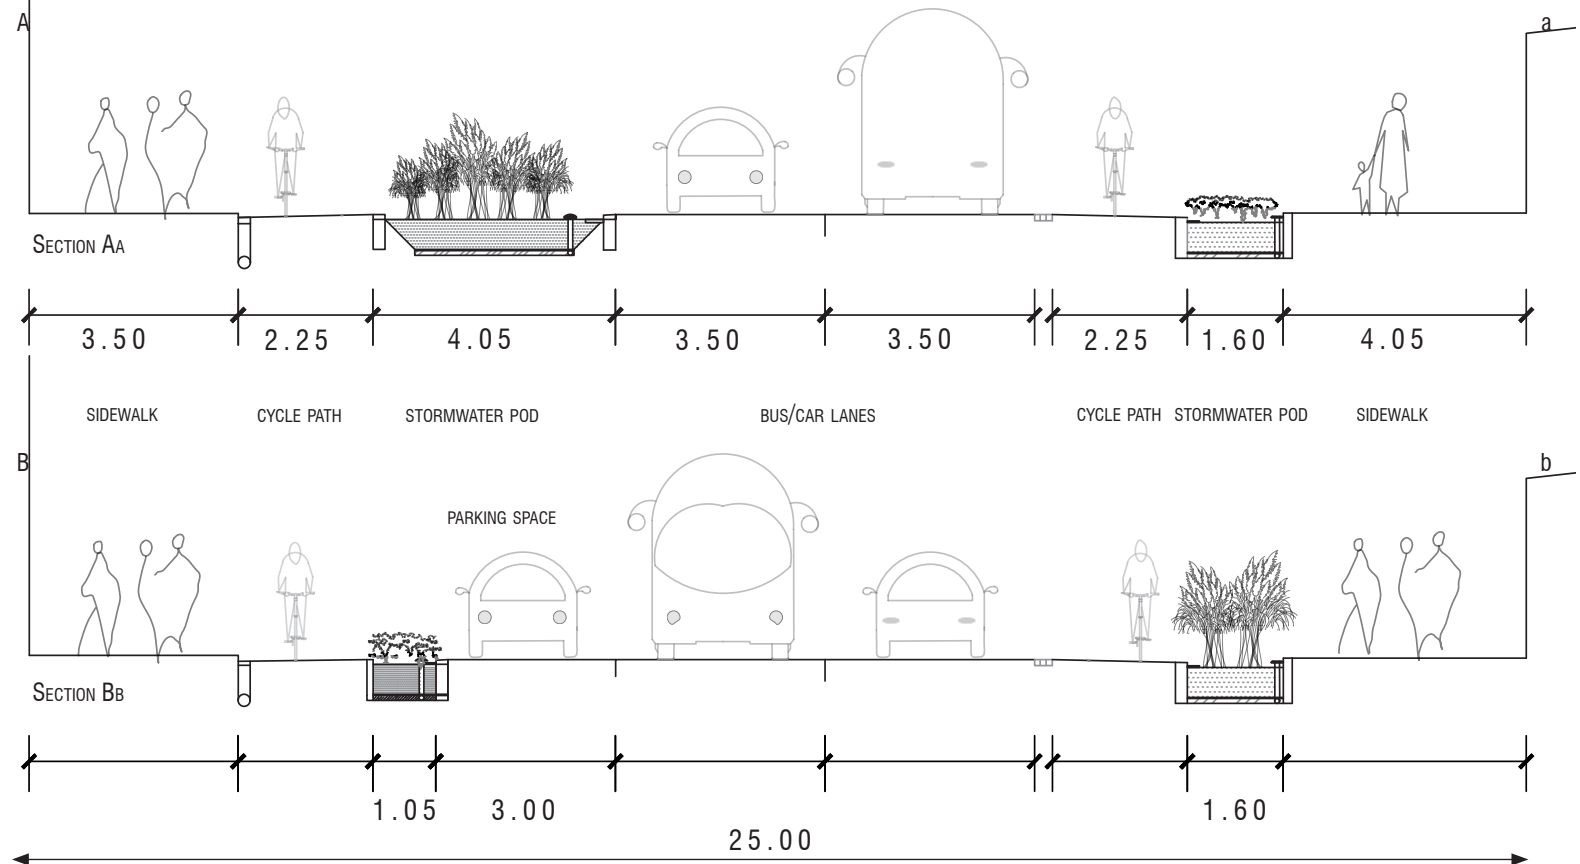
Cross-sections of the street - the top showing the maximum width of the stormwater pods and the bottom where parking pocket is fitted (m). Scale 1:125/A3
